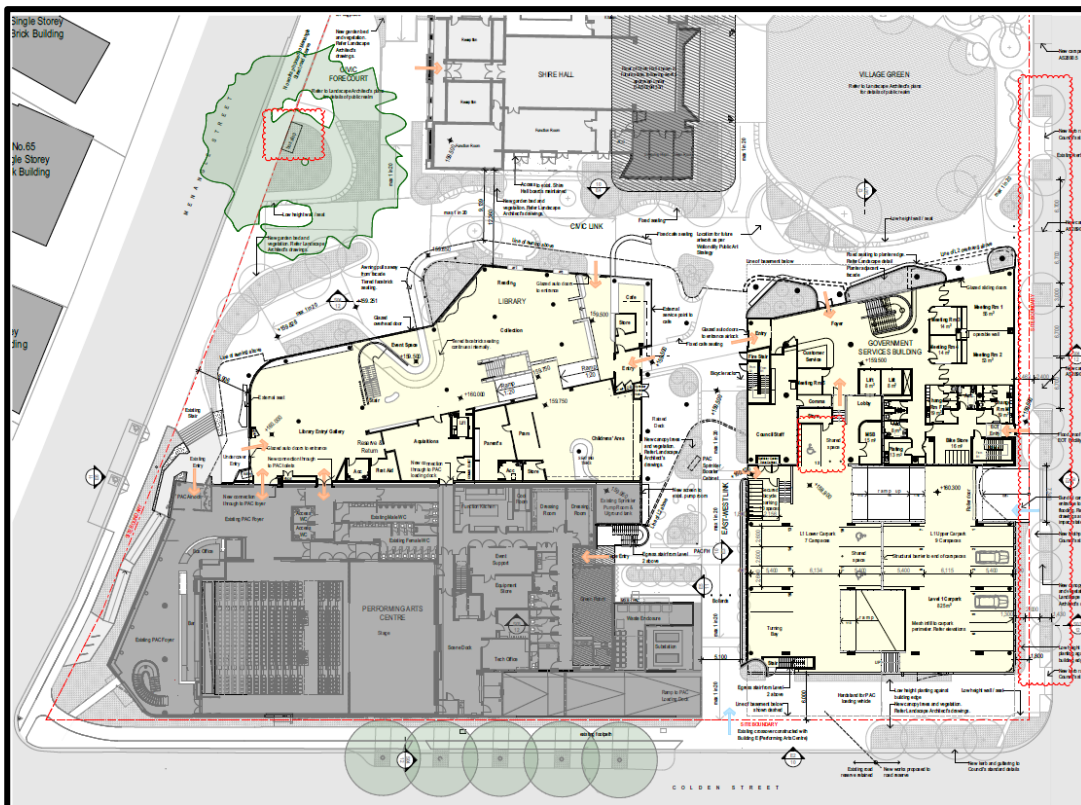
Proposed Ground Floor Plan (Source: William Ross Architects)
